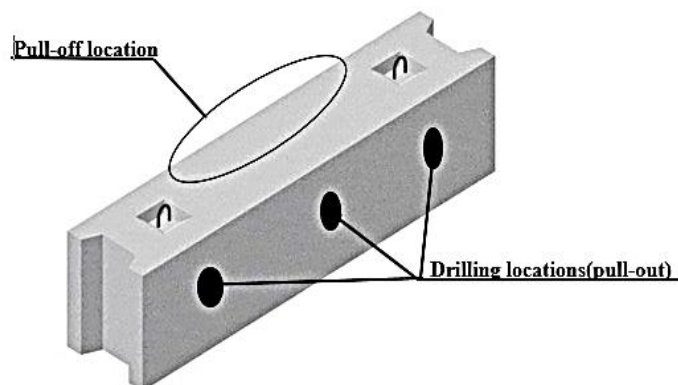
Prototype (foundation structure, tested in situ/laboratory)
